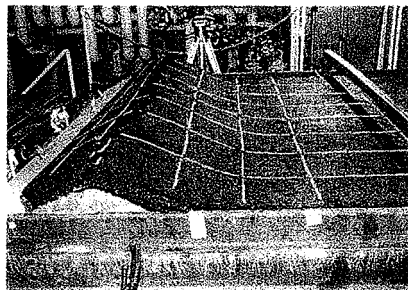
Final Configuration of the Model (Asphalt Paved ; Without Anchor Dowel ; Static)
